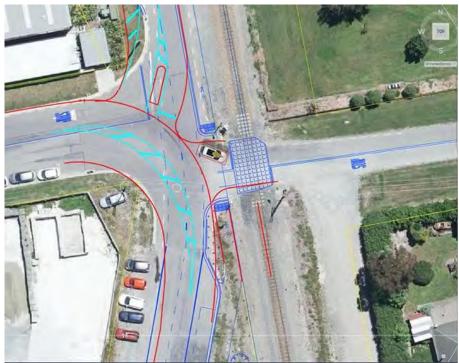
WSP concept to reconfigure priority of intersection Station Road/Railway Road
